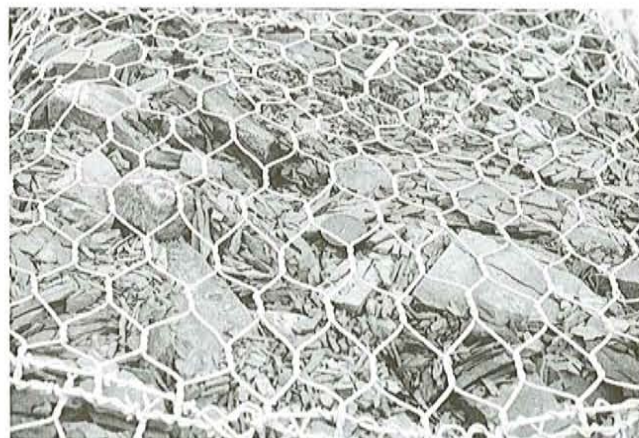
Premature deterioration of bedrock used as rip-rap in retaining wall, eastern Newfoundland.
